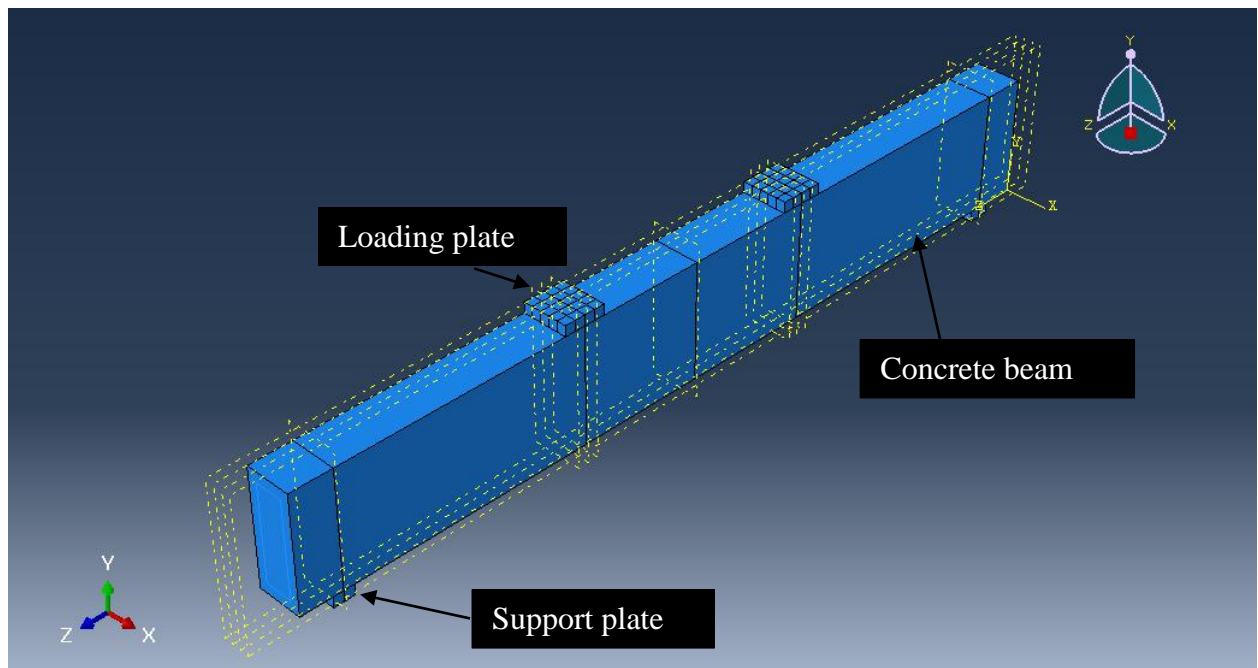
Model showing concrete beam, loading plates and support plates for all beams
